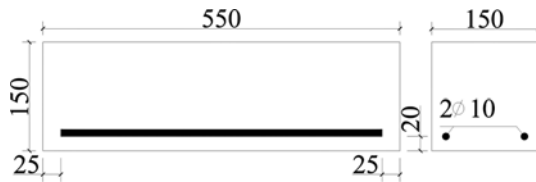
Schematic Diagram of the RC Specimen (mm)
